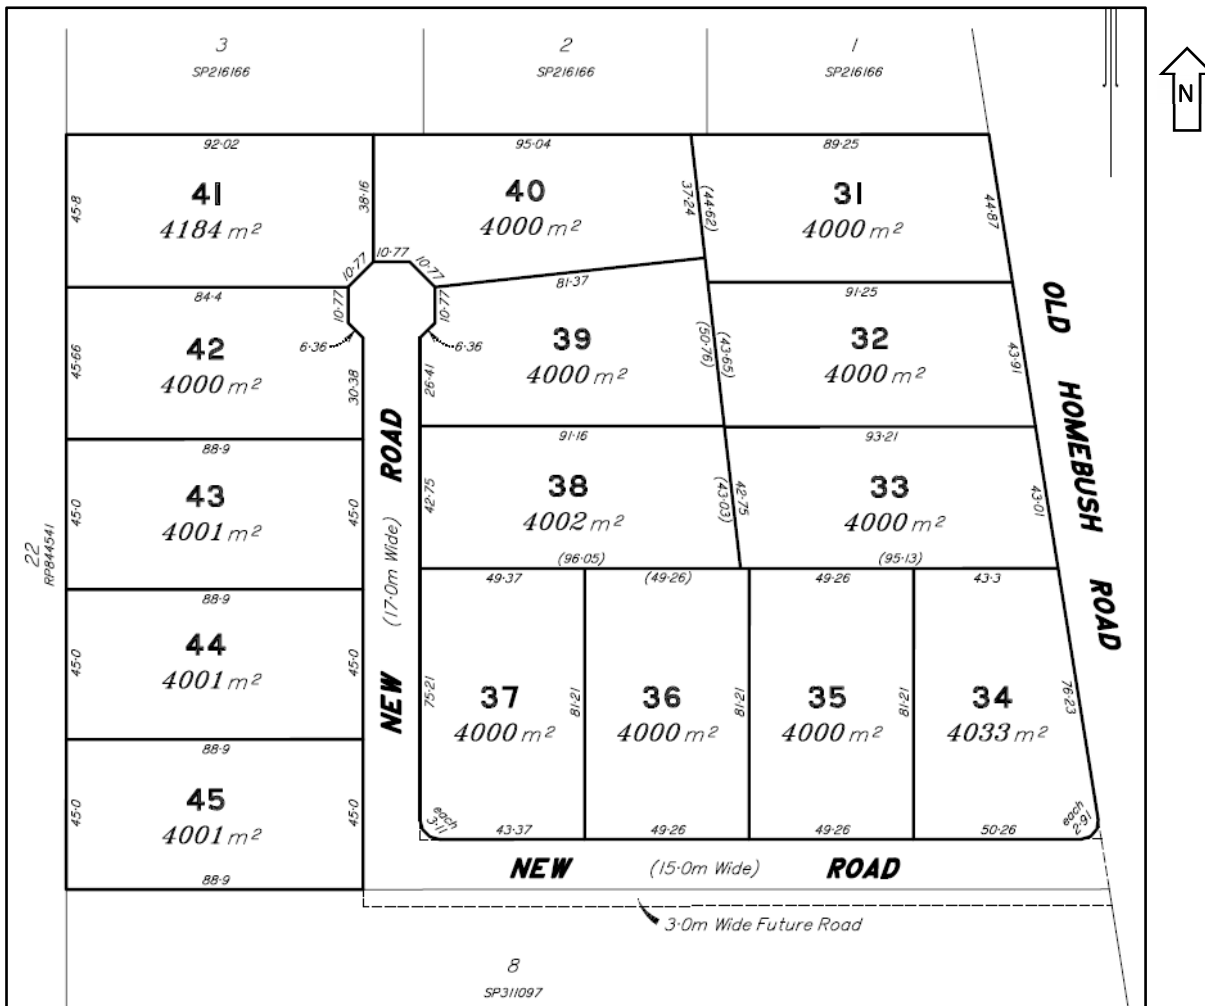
PLAN OF PROPOSED SUBDIVISION (K.J. WILSON DRAWING: K4822)
